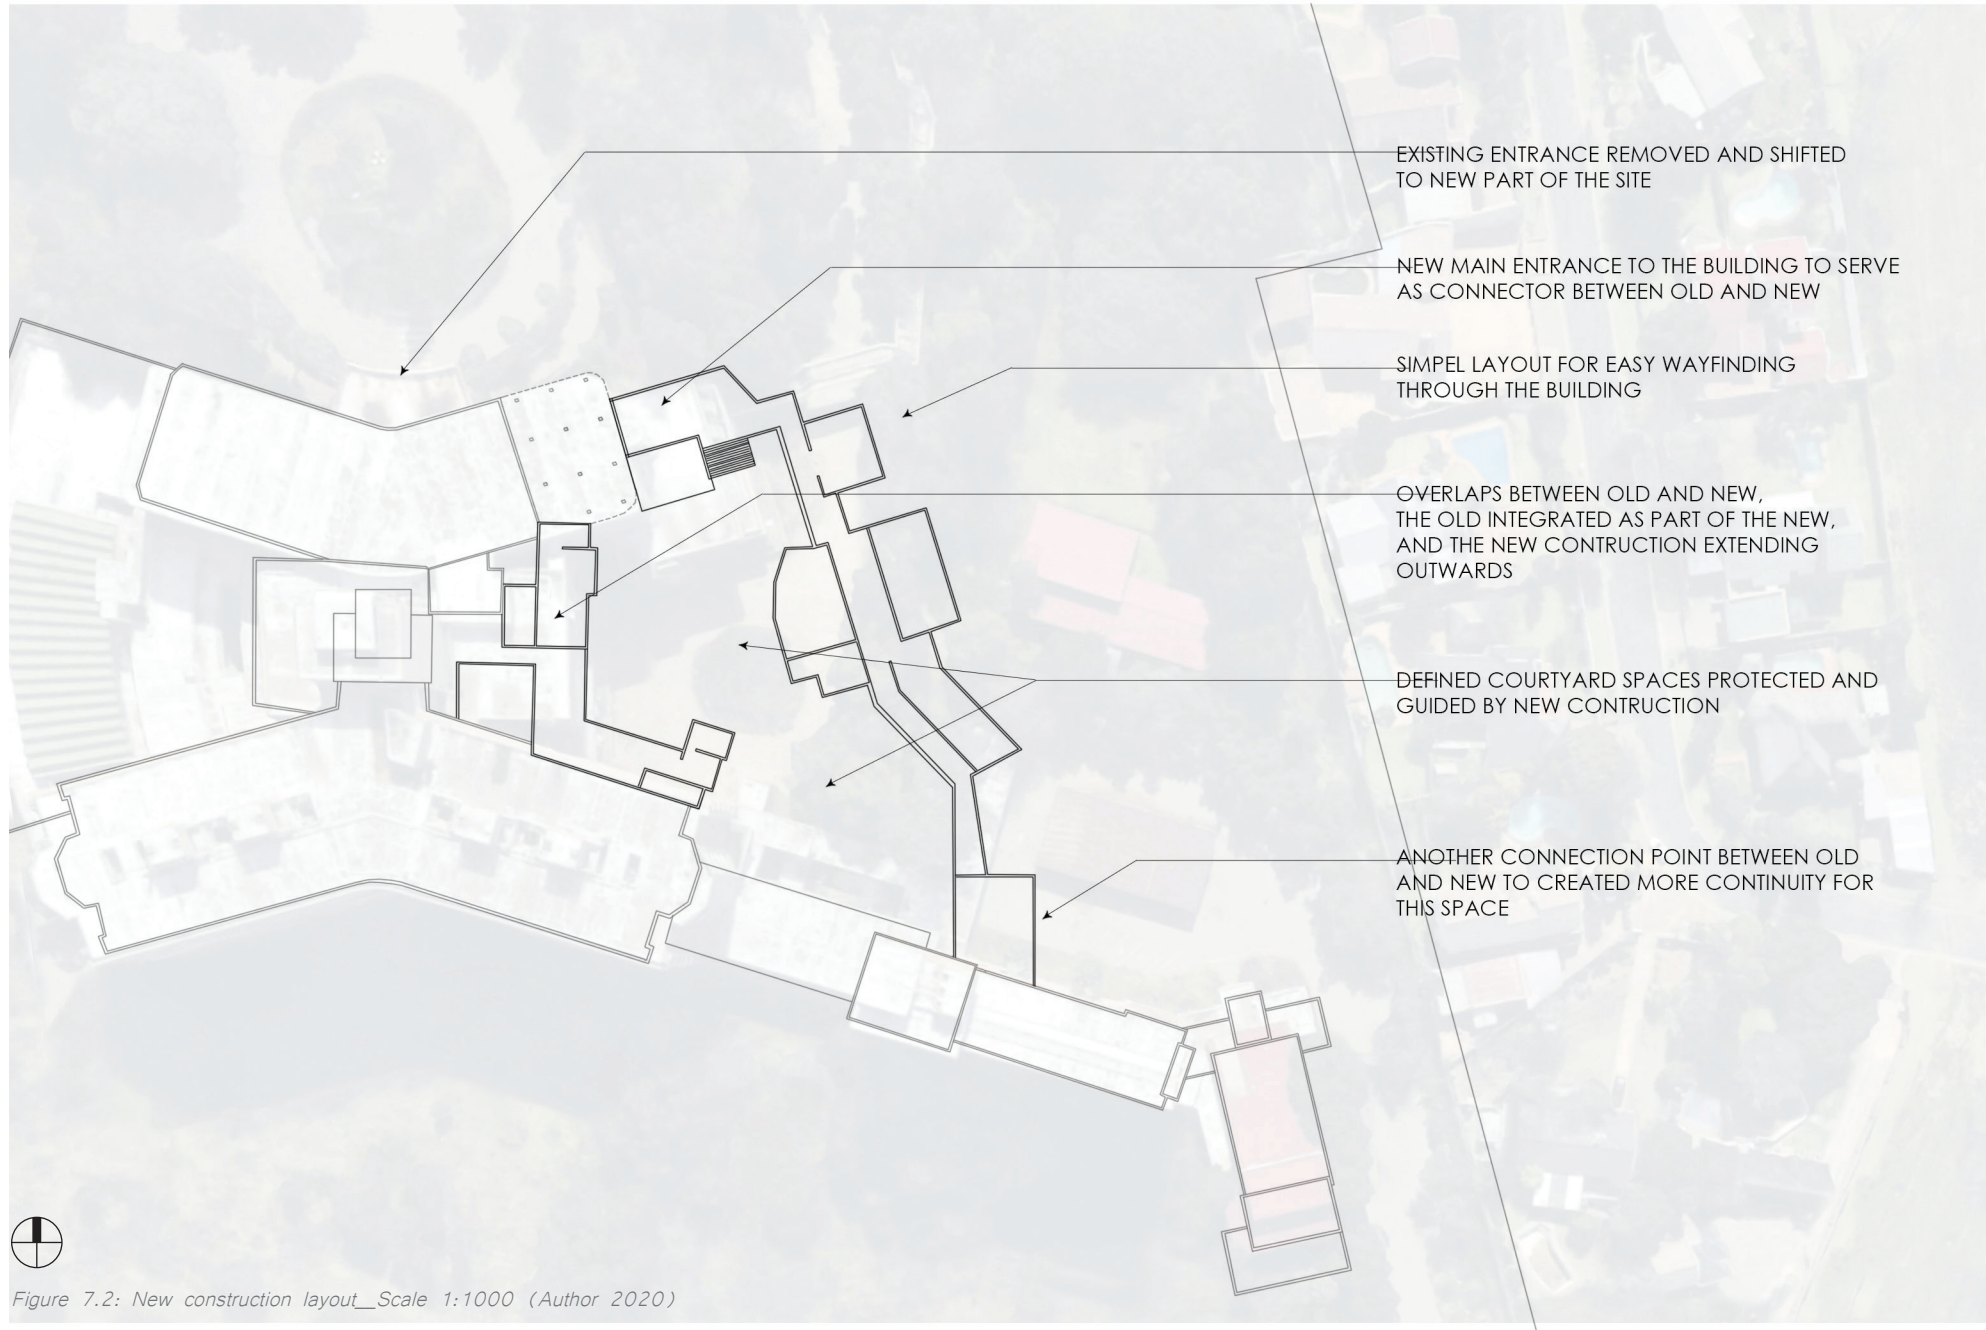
New construction layout_Scale 1:1000 (Author 2020)
